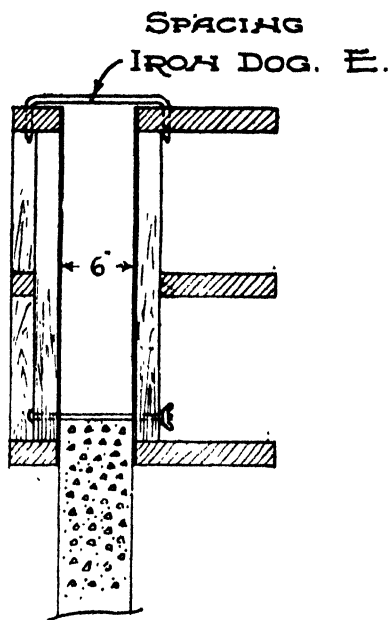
Section of Wall, showing Position of Wooden Forms (single set).
